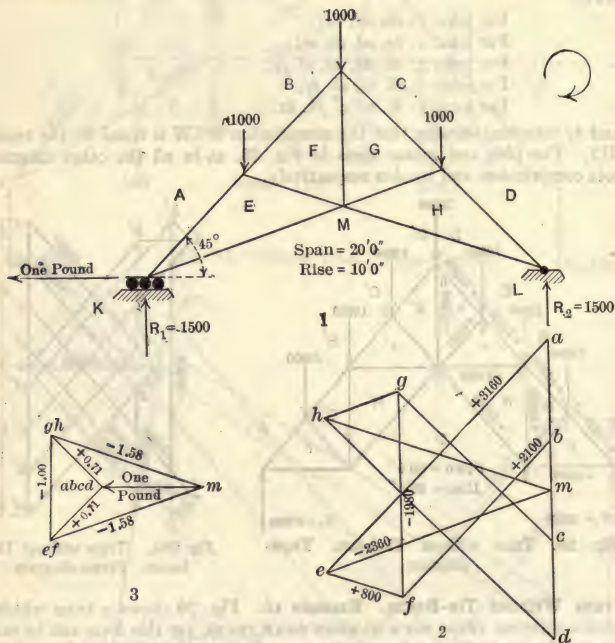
B. Simple Scissors Truss and Stress-diagrams
